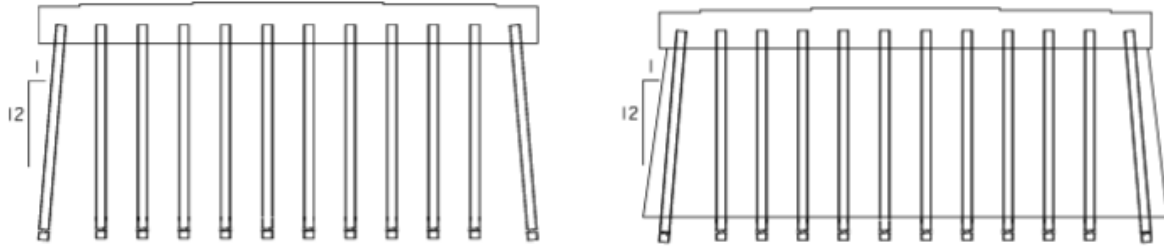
Pile bent with individually encased piles (left) and fully encased piles (right)
